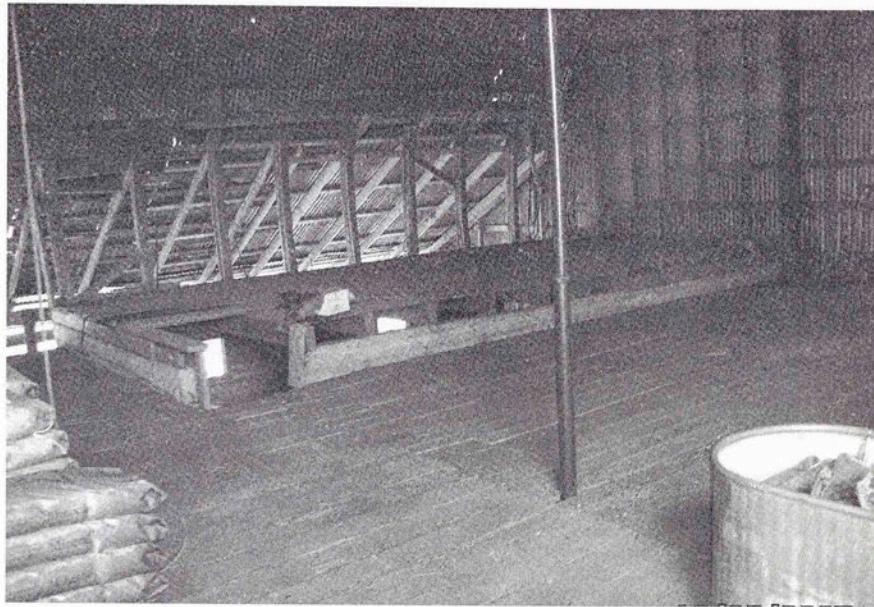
Loft floor with concrete granary built into the floor. (Photo by Lynda Ramsey)
